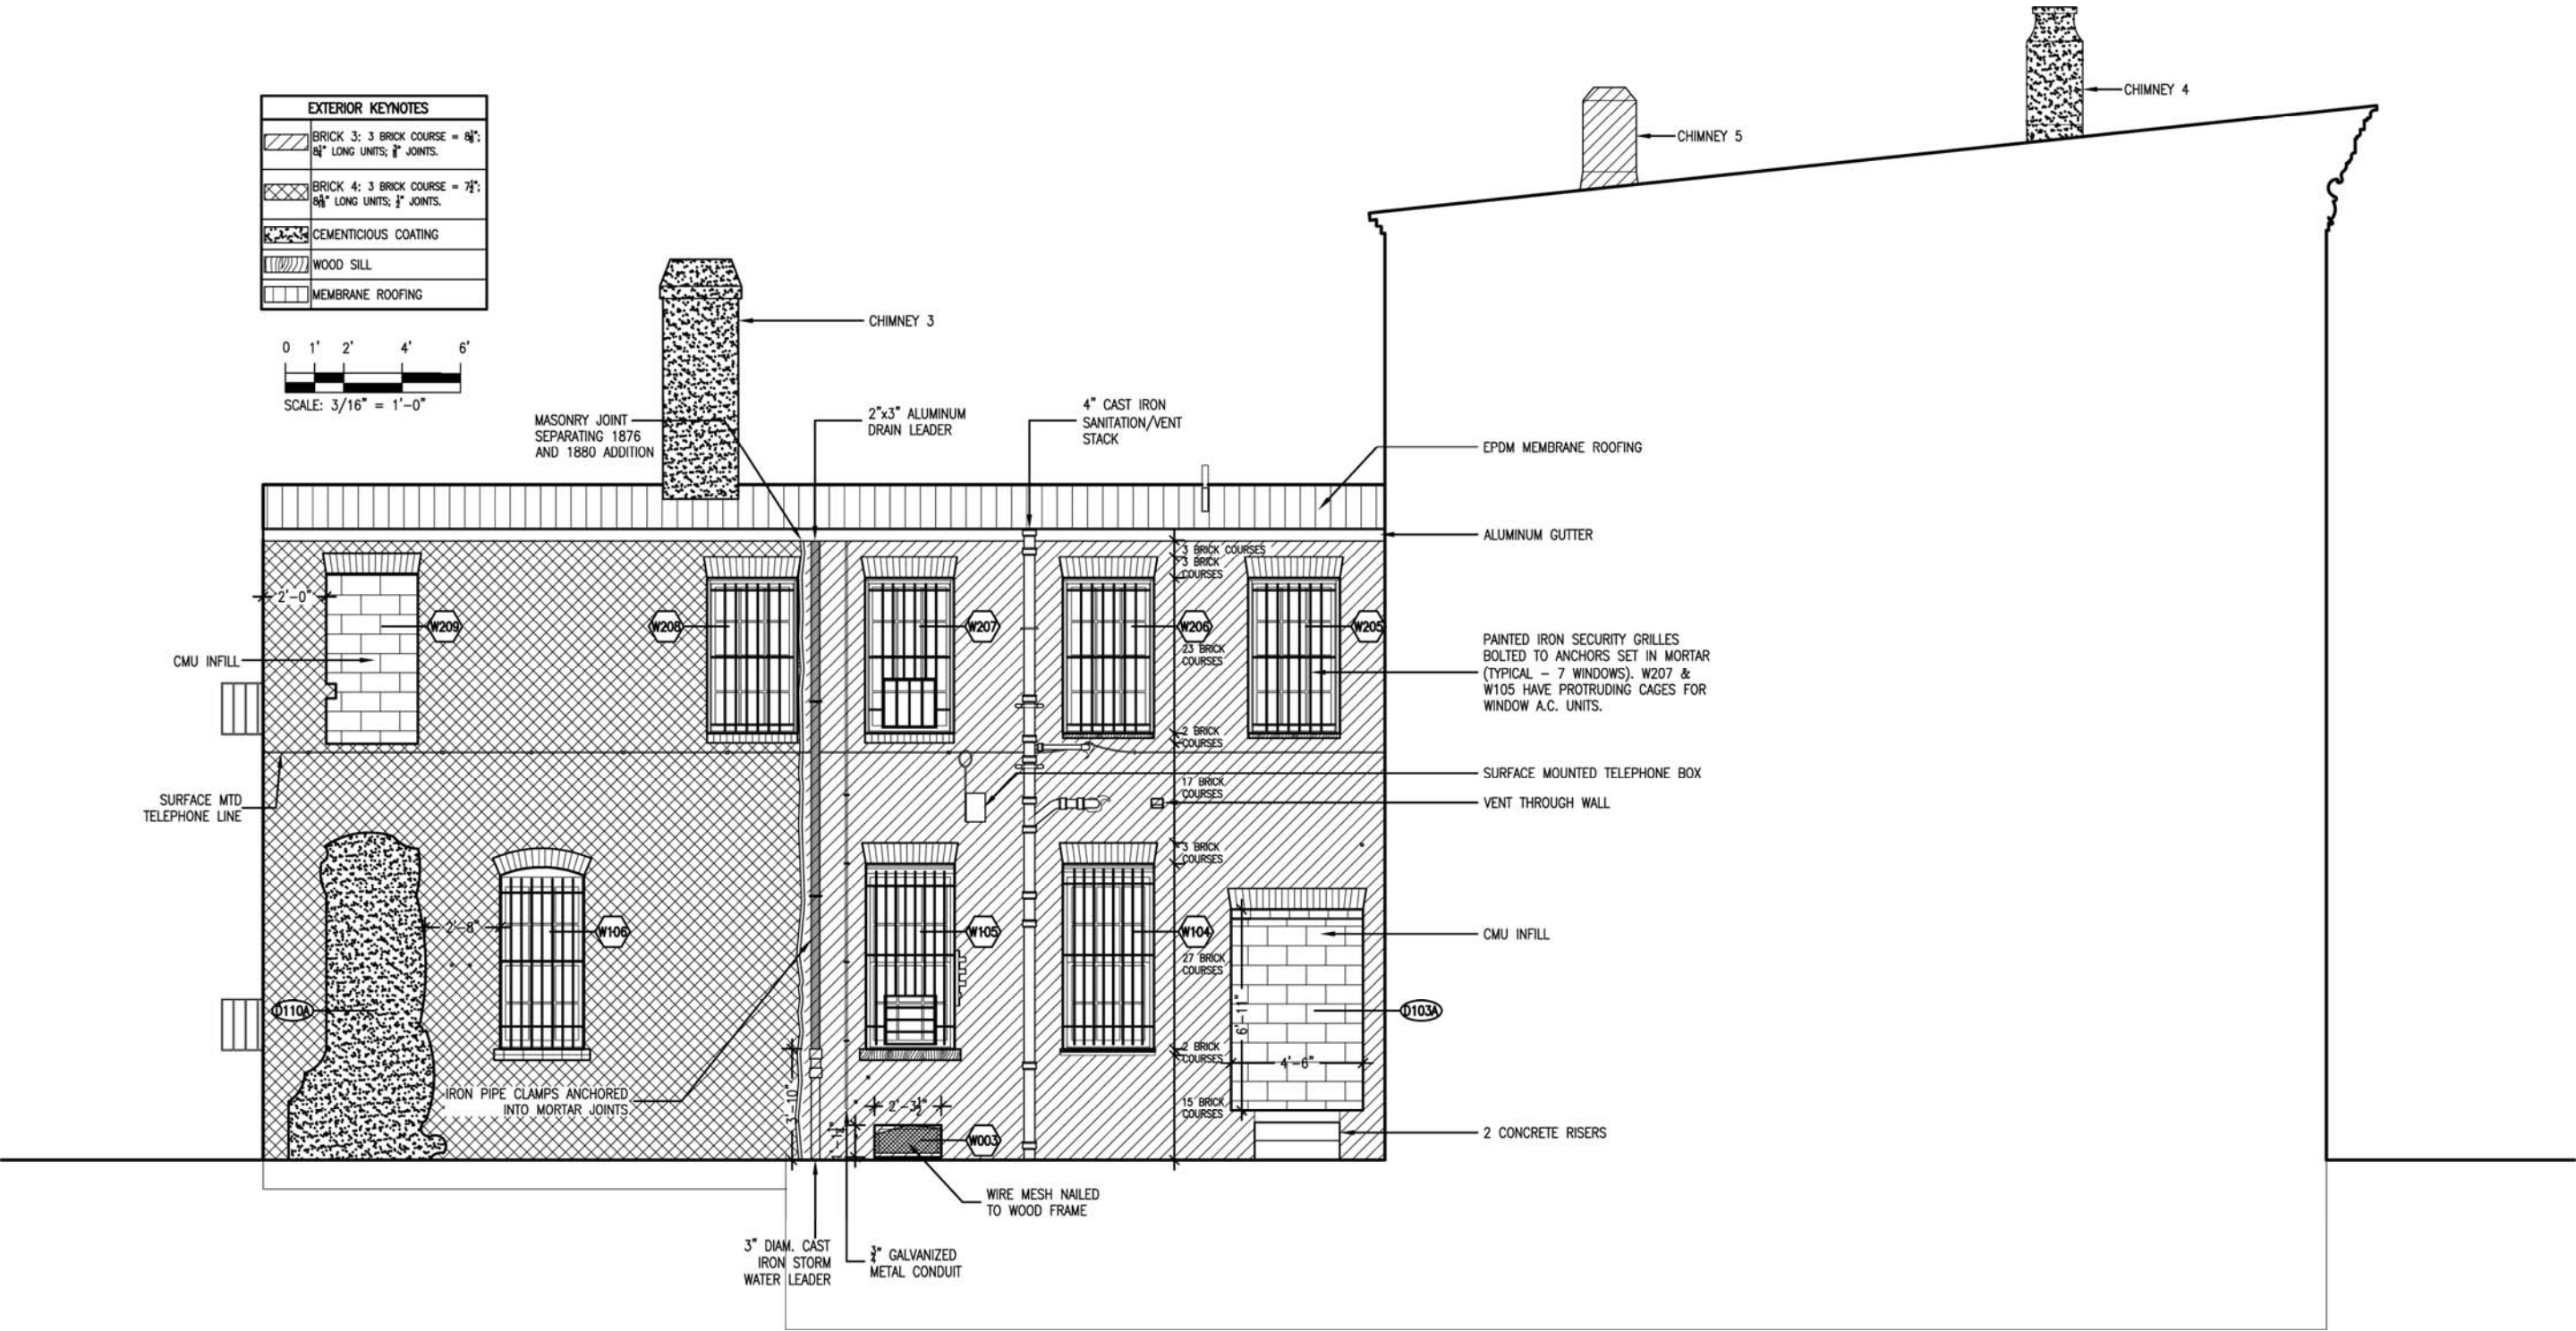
South Elevation – Inventory of Exterior Character Defining Features, Spaces and Elements
